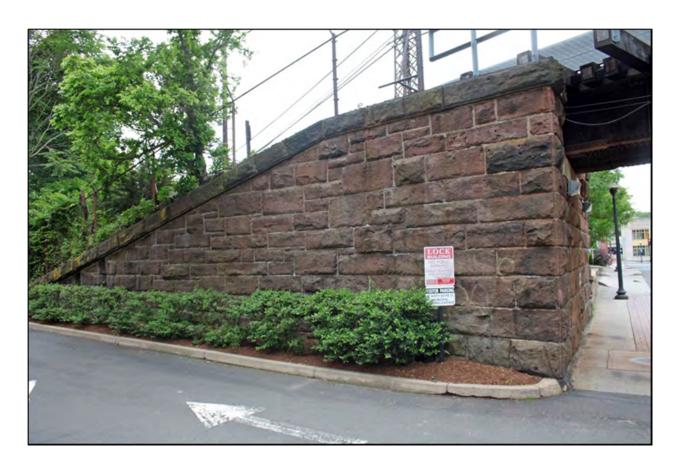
Marshall Street Bridge, east side, camera facing west.
